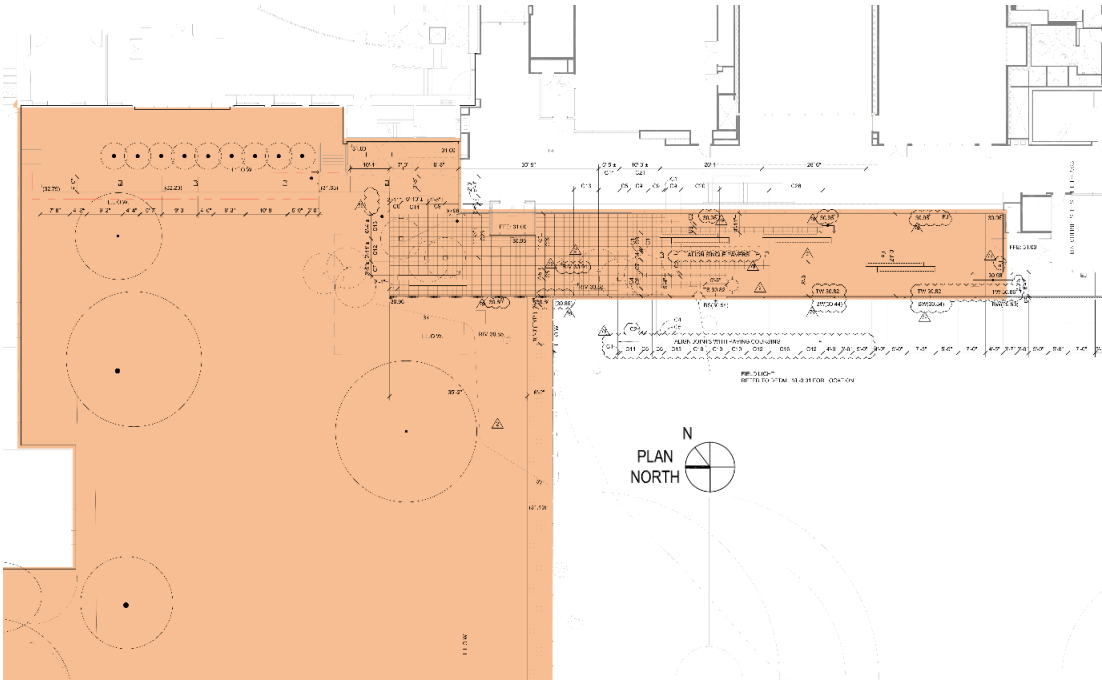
First Floor North Plan - Courtyard Plaza and Entrance
